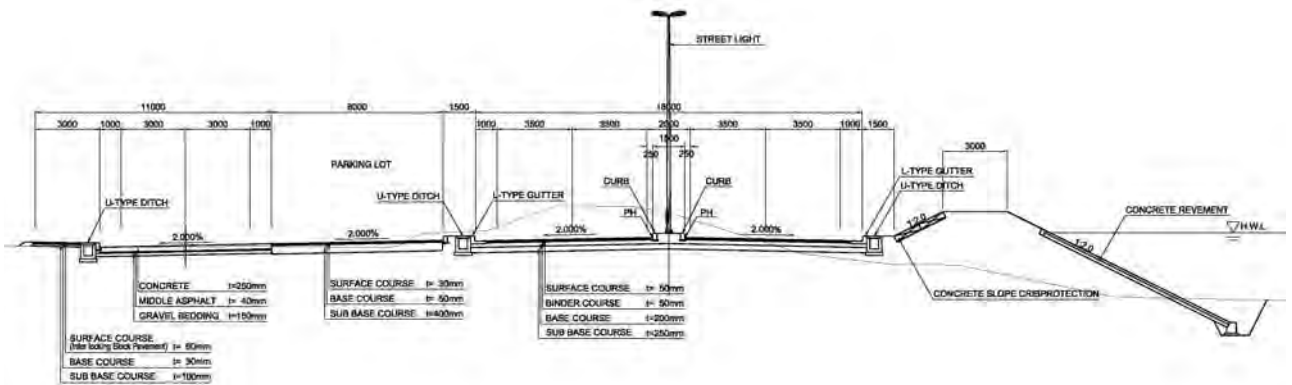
(4) Typical Cross Section Parallel to West Industry Road
